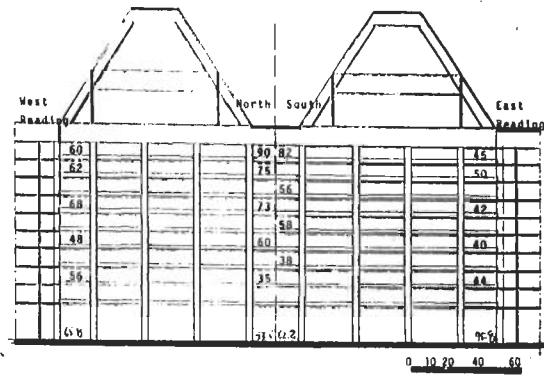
Longitudinal Section of Rectangular Atrium Looking North, Showing Illuminances Normal to Walls and Floor
